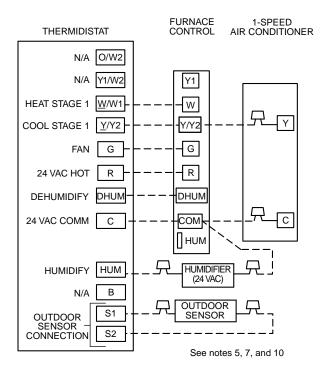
Single-Stage Furnace with 1-Speed Air Conditioner
